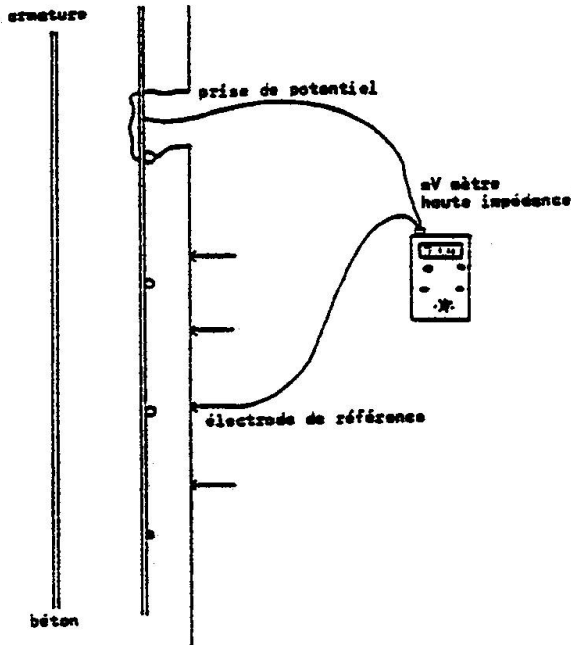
Principle of measurement of elastic potential between steel bar and concrete
